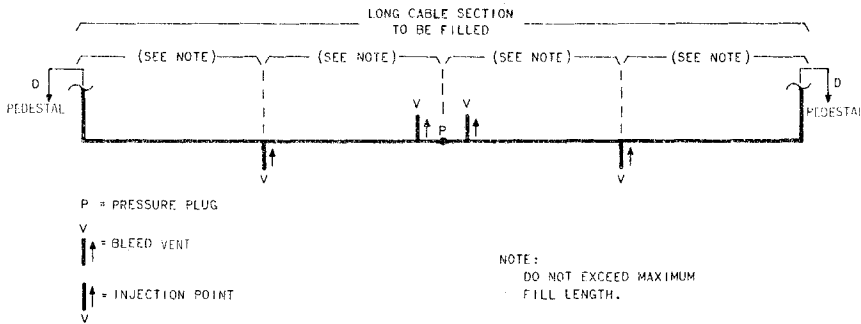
Method of Dividing Long Cable Into Fill Sections
